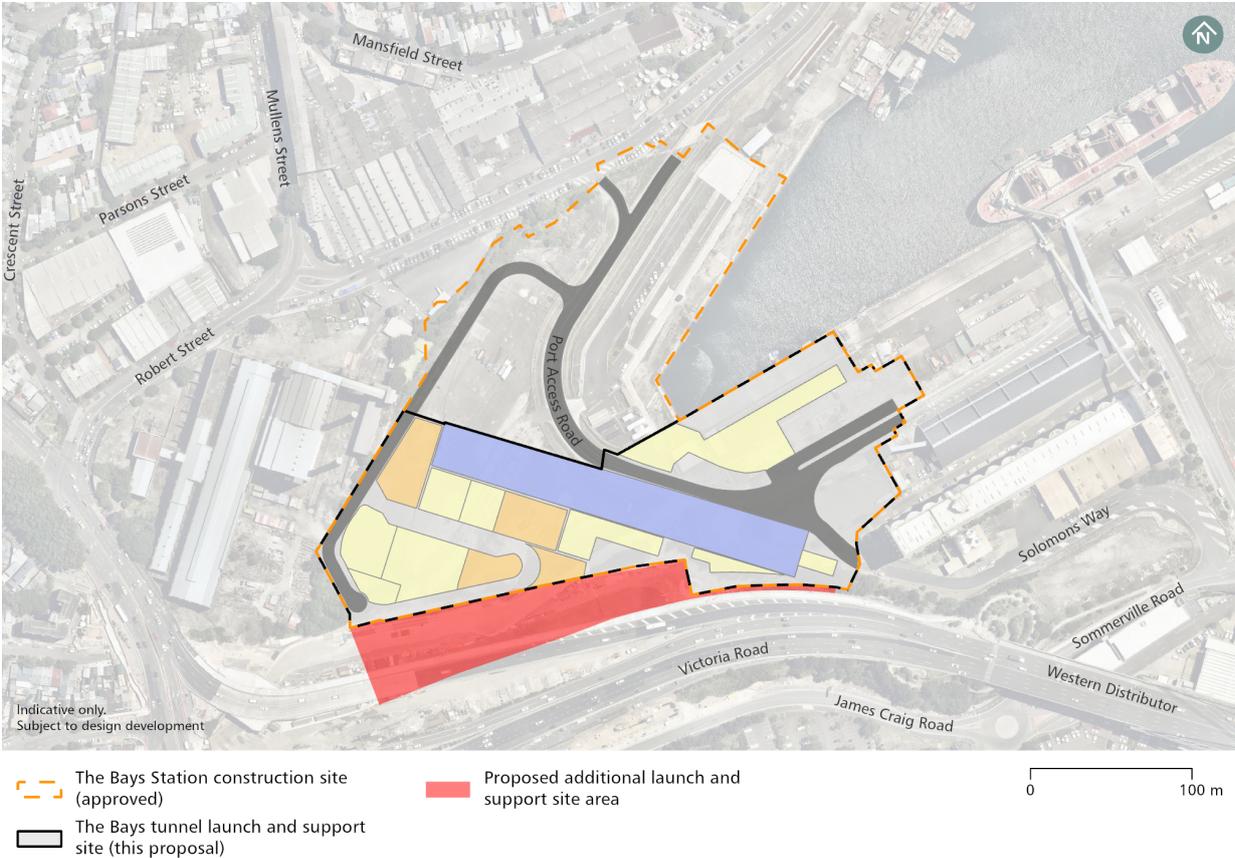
Modified boundary at The Bays tunnel launch and support site
